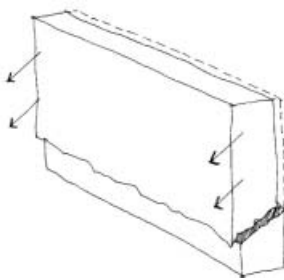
Moisture damage can result in a weak plane developing along which a wall can slide and collapse.
